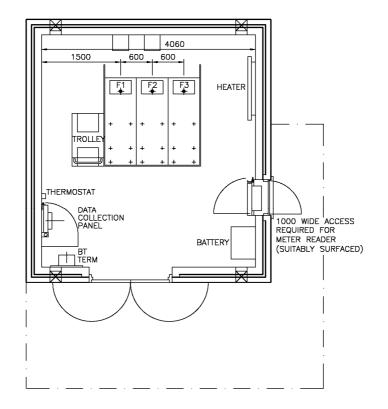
Typical Layout for an Industrial HV Switching Substation
